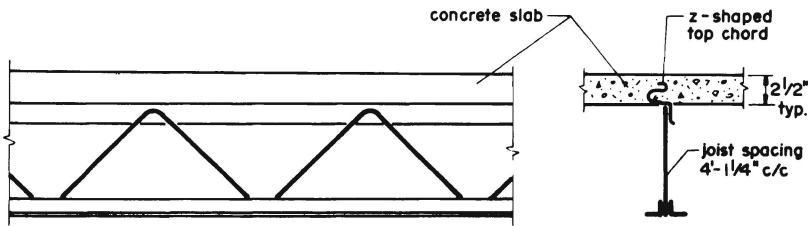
Composite floor with open web steel joist (1 in. = 25.4mm)
